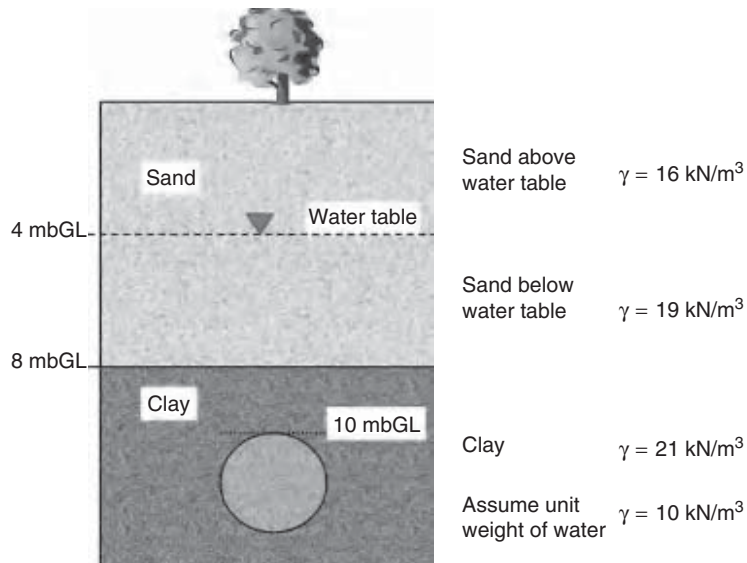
Soil profile with tunnel to be constructed with crown at 10mbGL
